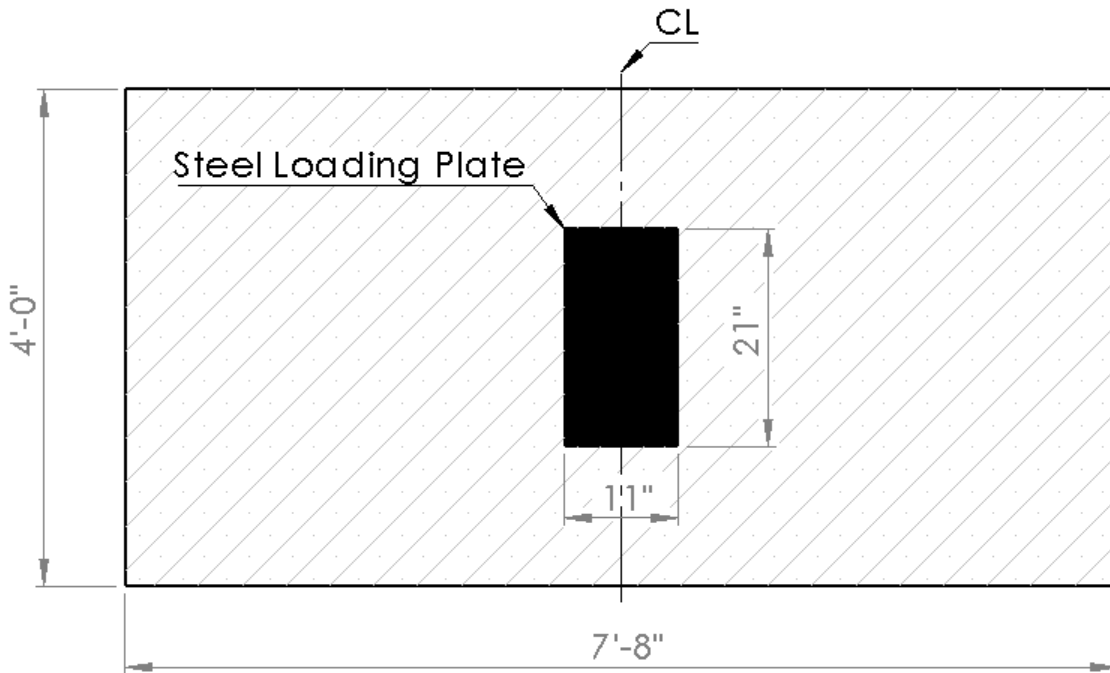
Schematic drawing of concrete panel with loading plate (plan view)
